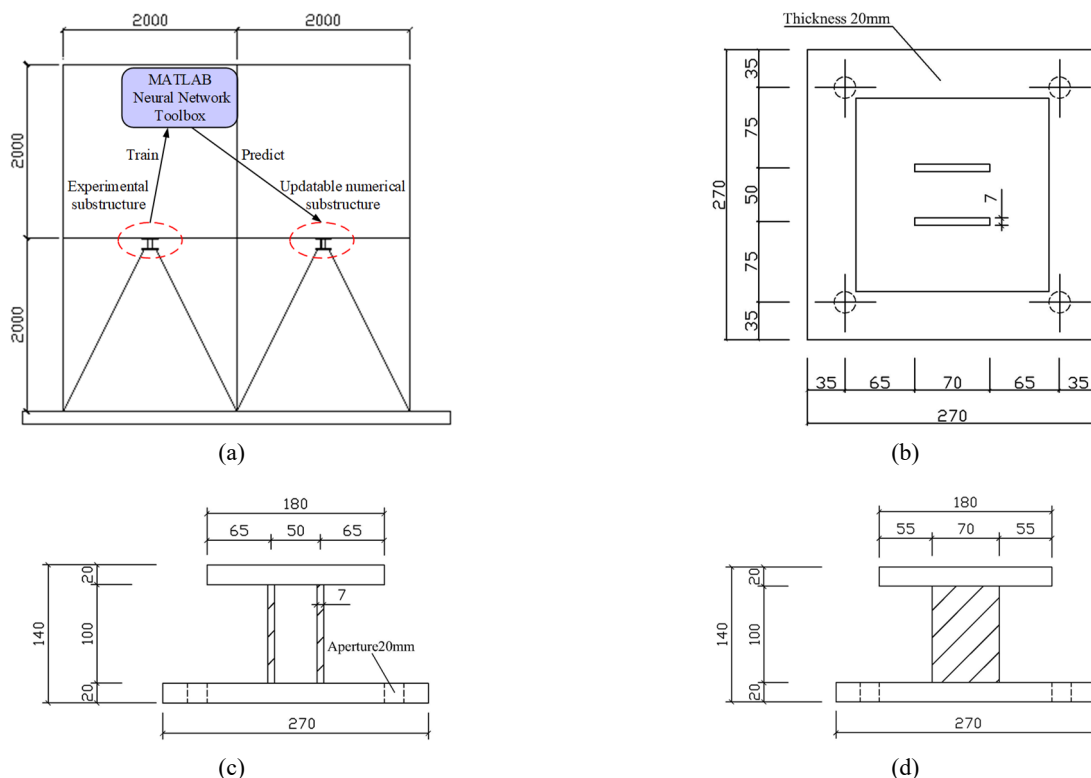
(a) Steel frame model with bending dampers; (b) top view of bending damper; (c) left view of bending damper; (d) elevation view of bending damper (Unit: mm)
